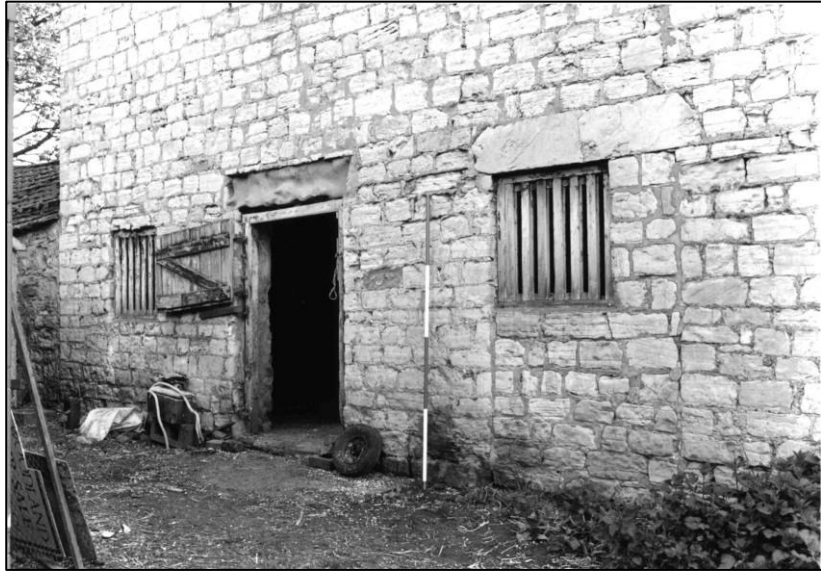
Granary: GF N cell, W elevation, looking E (photo 1/12).
